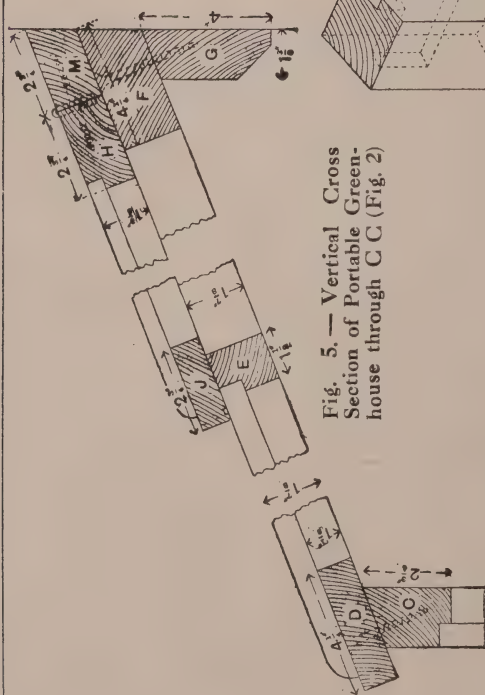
Vertical Cross Section of Portable Greenhouse through C C (Fig. 2)
